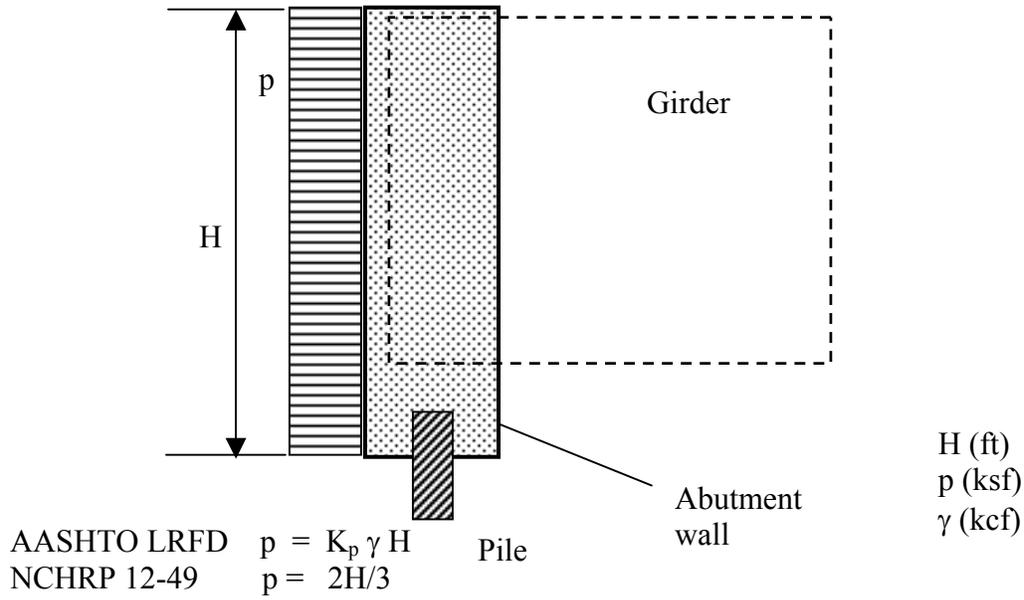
Passive pressure distribution behind abutment wall under seismic loads.
